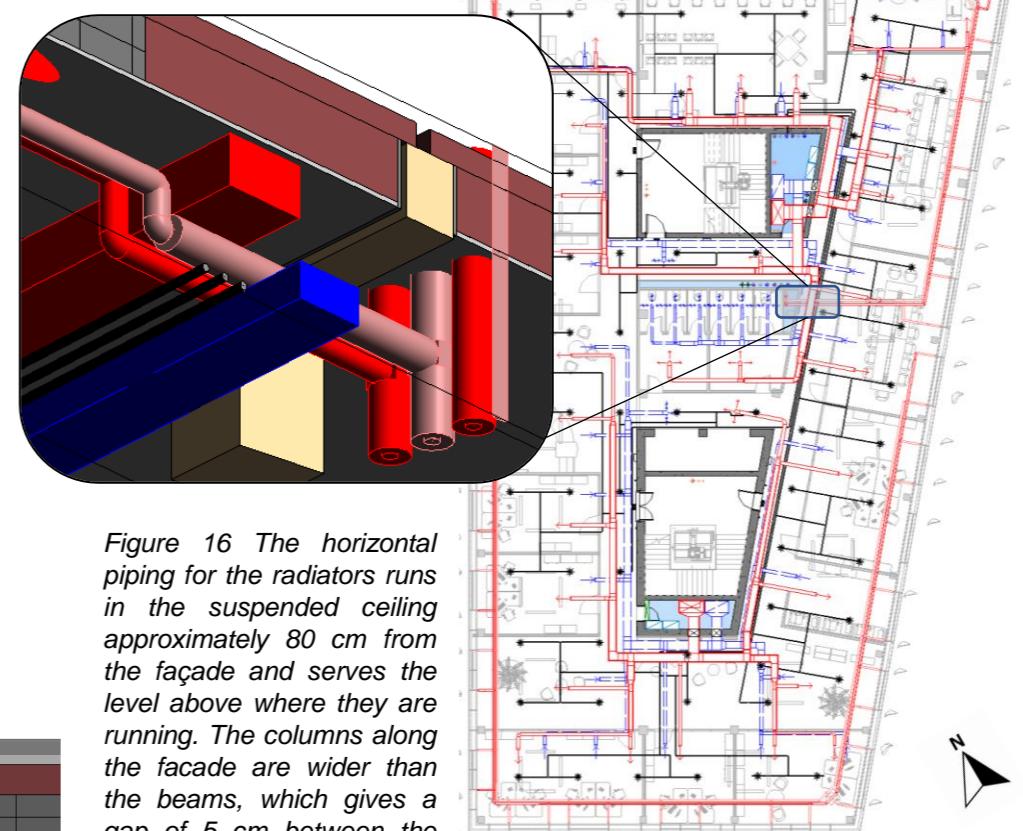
The horizontal piping for the radiators runs in the suspended ceiling approximately 80 cm from the façade and serves the level above where they are running. The columns along the facade are wider than the beams, which gives a gap of 5 cm between the façade and the slab, the pipes are running in this gap, which will be fire insulated.
